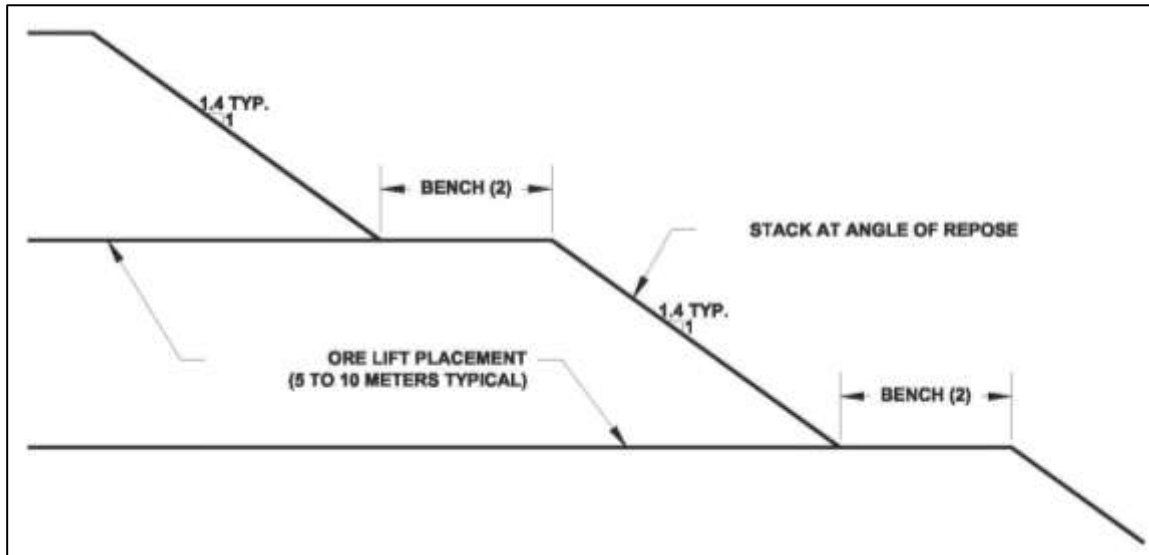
Typical cross section showing individual lifts and offset benches along exterior slope of heap leach pad to provide stability.
